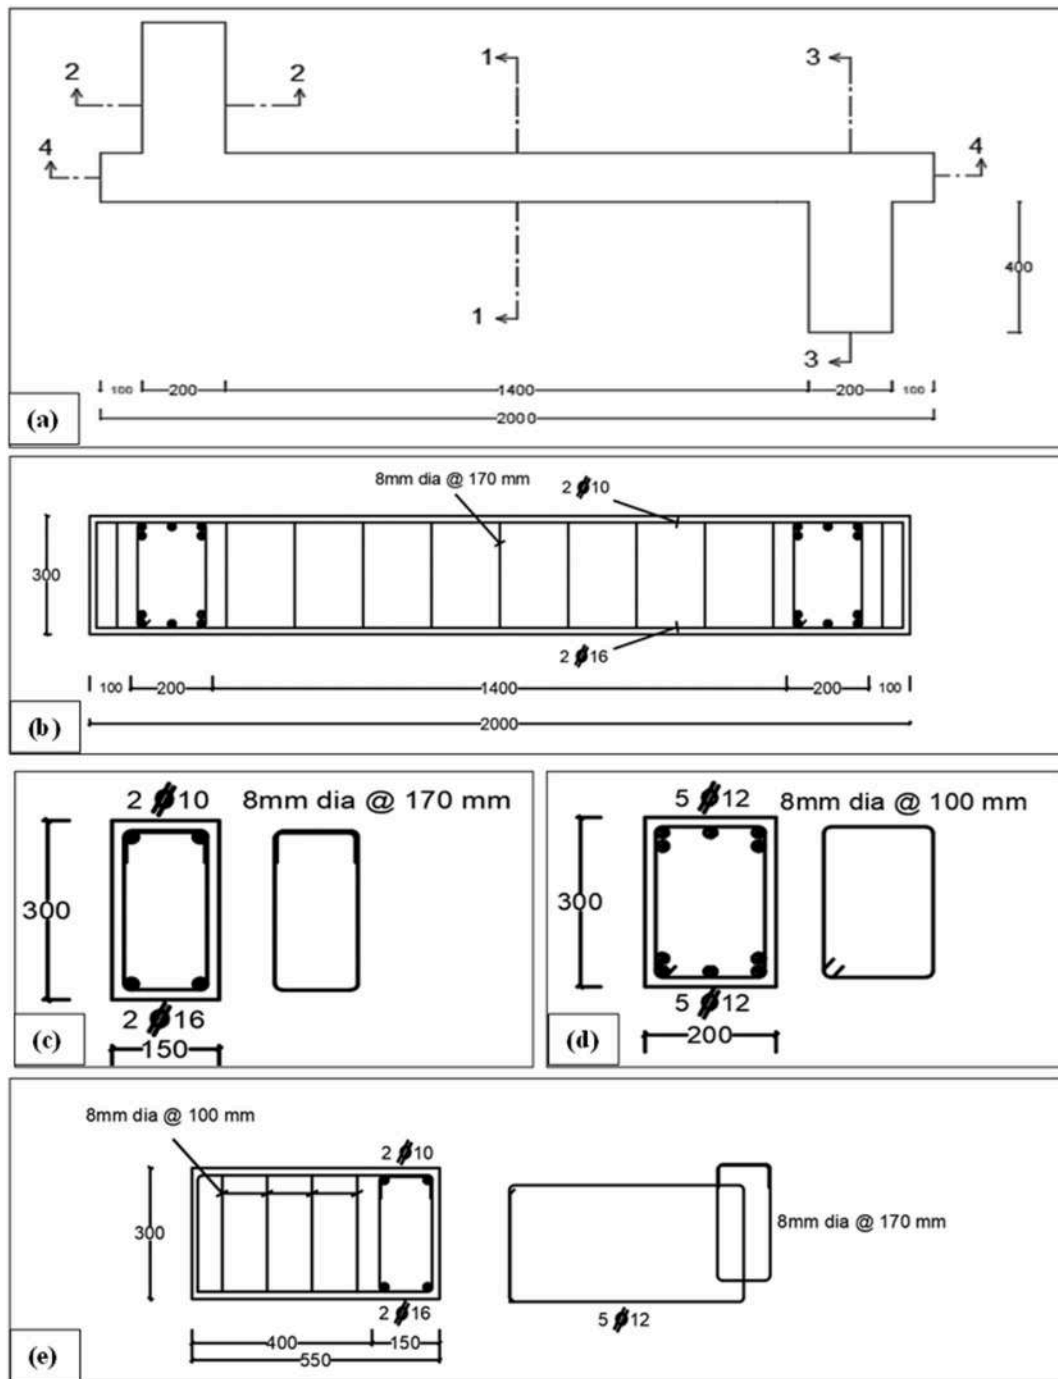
Geometric properties of specimens (a) the plane of specimens, (b) longitudinal section of the beam (section 4-4), (c) cross-section area of the beam (section 1-1), (d) cross-section area of the cantilever (section 2-2) and (e) longitudinal section of the cantilever (section 3-3).
